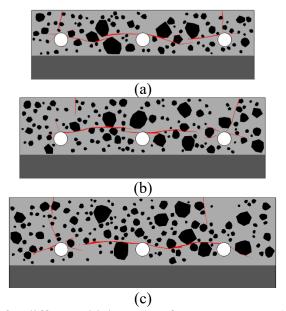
Crack patterns for different thicknesses of concrete cover: (a) 20 mm; (b) 30 mm; (c) 40 mm.
